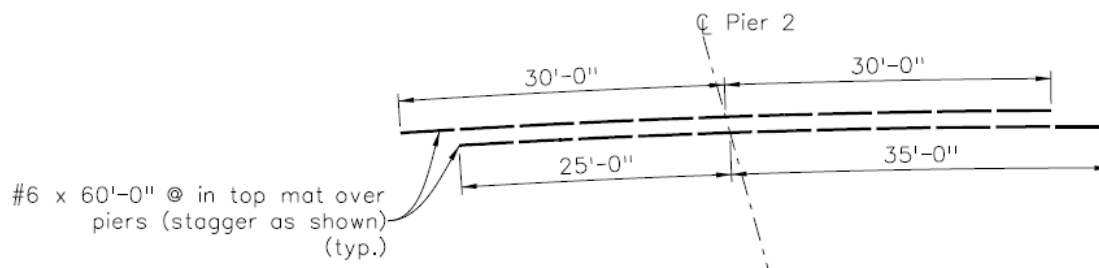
Example 2: Rebar not controlled by concrete dimensions
